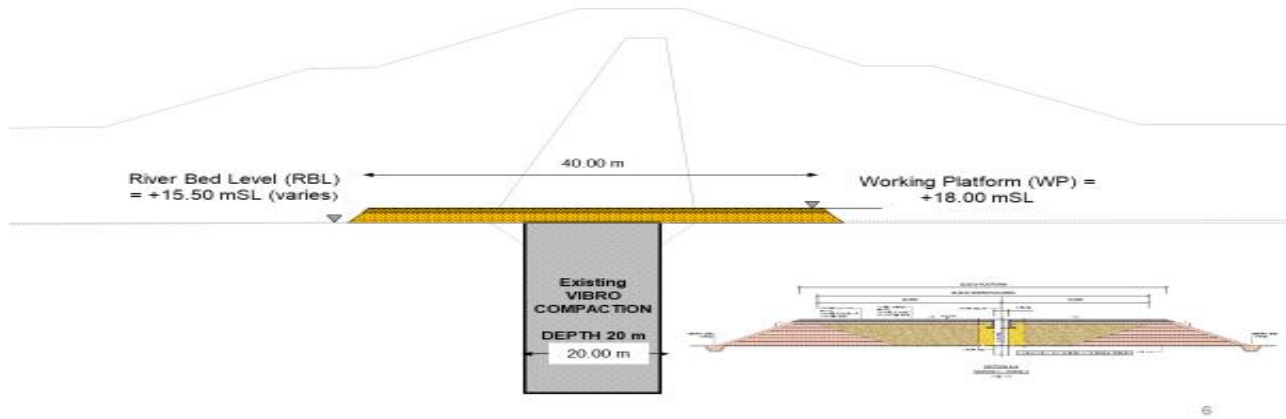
Construction Arrangement for Diaphragm Wall:
